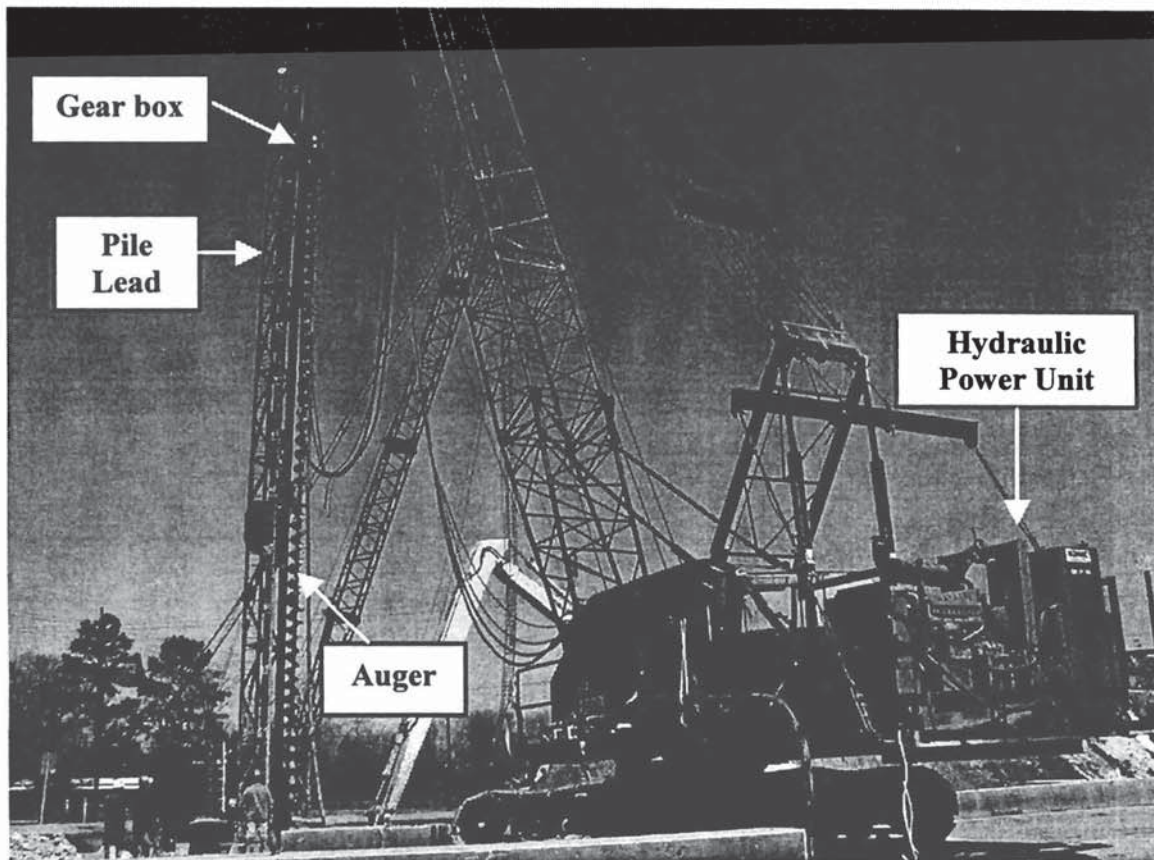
Drilling Rig Setup for Installing Central Bent Piles
